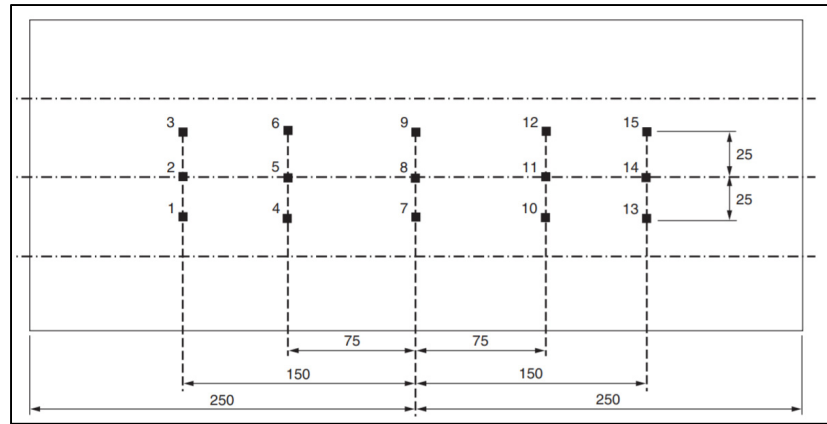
Plan view of measurement points on top of slab (mm) (LC 21-410)
